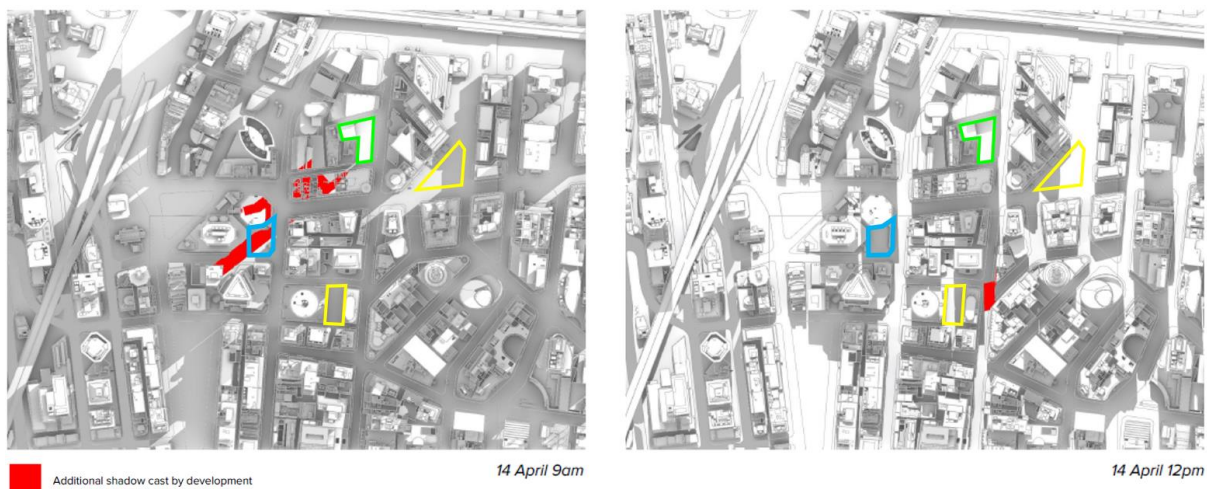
Overshadowing caused by proposed development at 9am and 12pm on 14 April. Subject tower site outlined in green. 243-257 George Street identified in blue. Protected public places identified in yellow.
